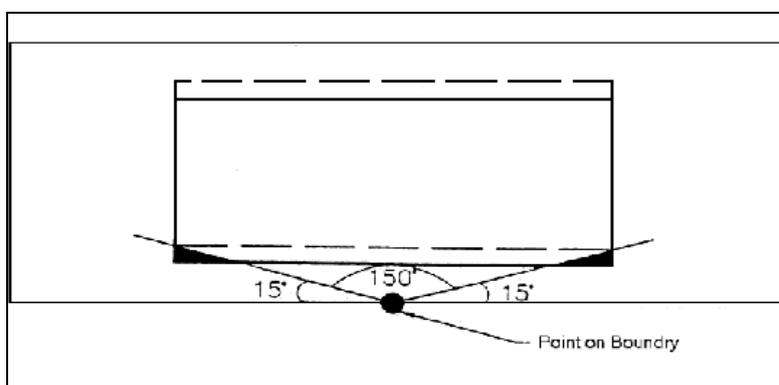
Example of a unit built within a 150 degree angle, centred on the boundary
